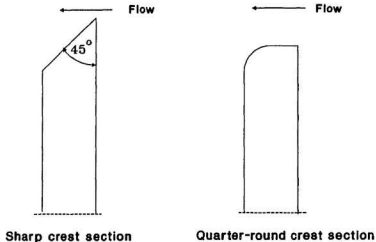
Sketch illustrating sharp crest section and quarter-round crest section. Modified from Houston (1982 and 1983).
